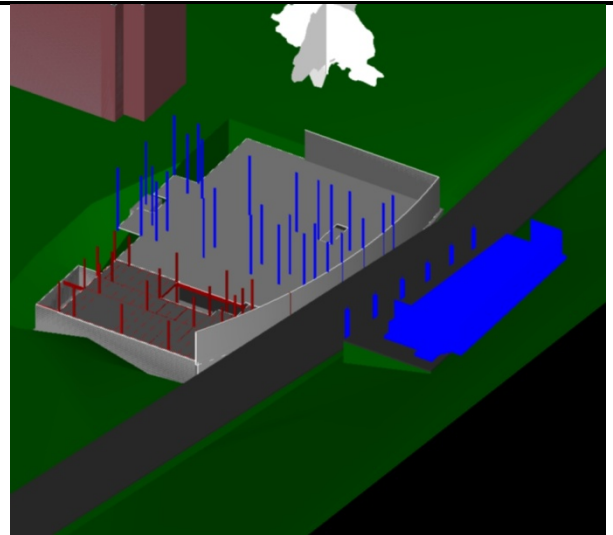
Columns 1st to 3rd, Z3 & Z4, South Foundation
